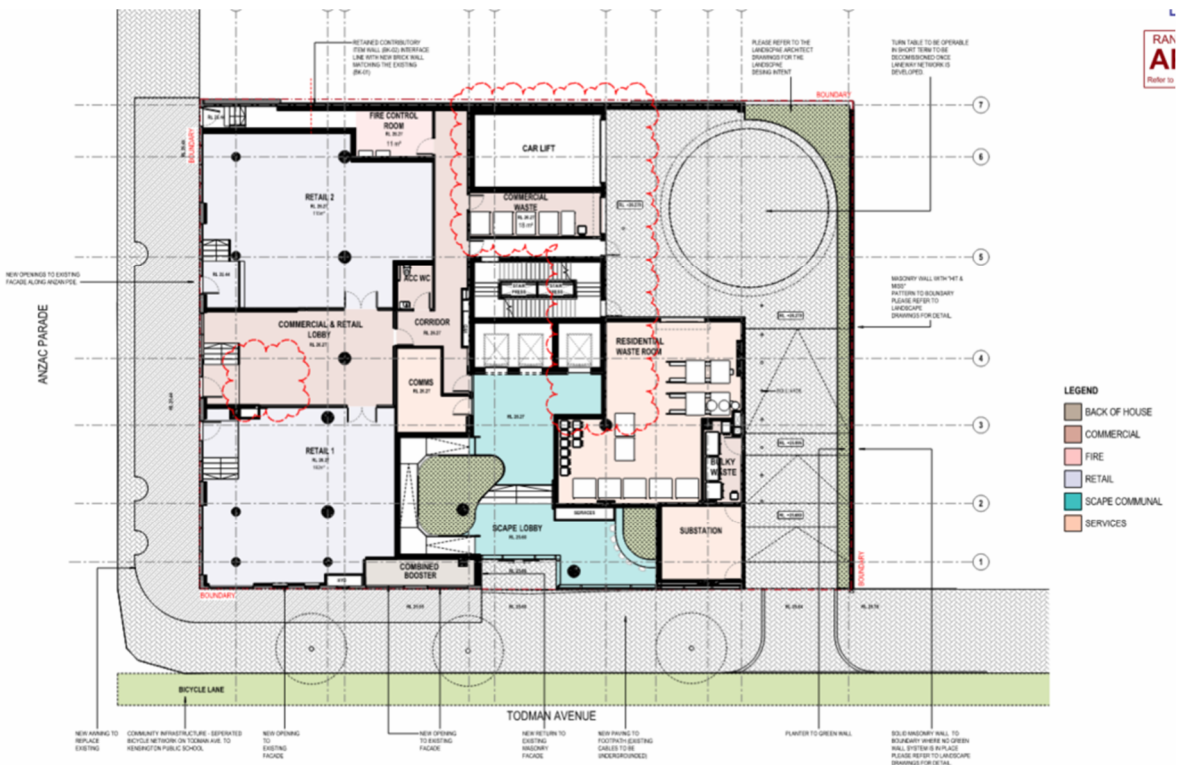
Approved ground floor plan (Source: DA/414/202/B)
